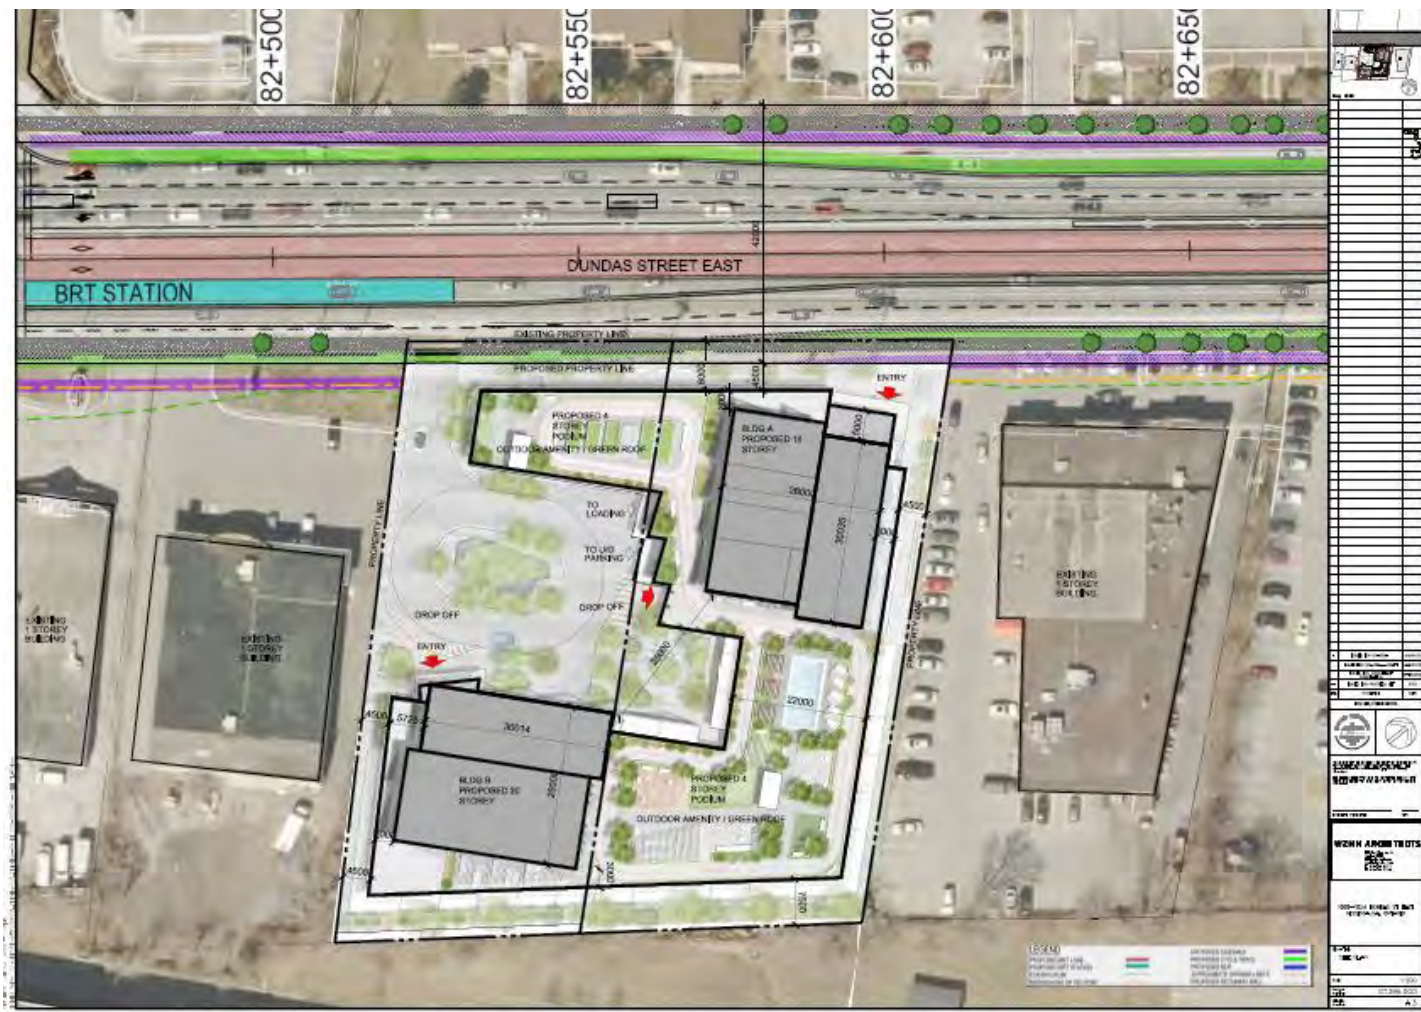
Site Plan showing no front yard parking and underground parking being accessed by a laneway.
